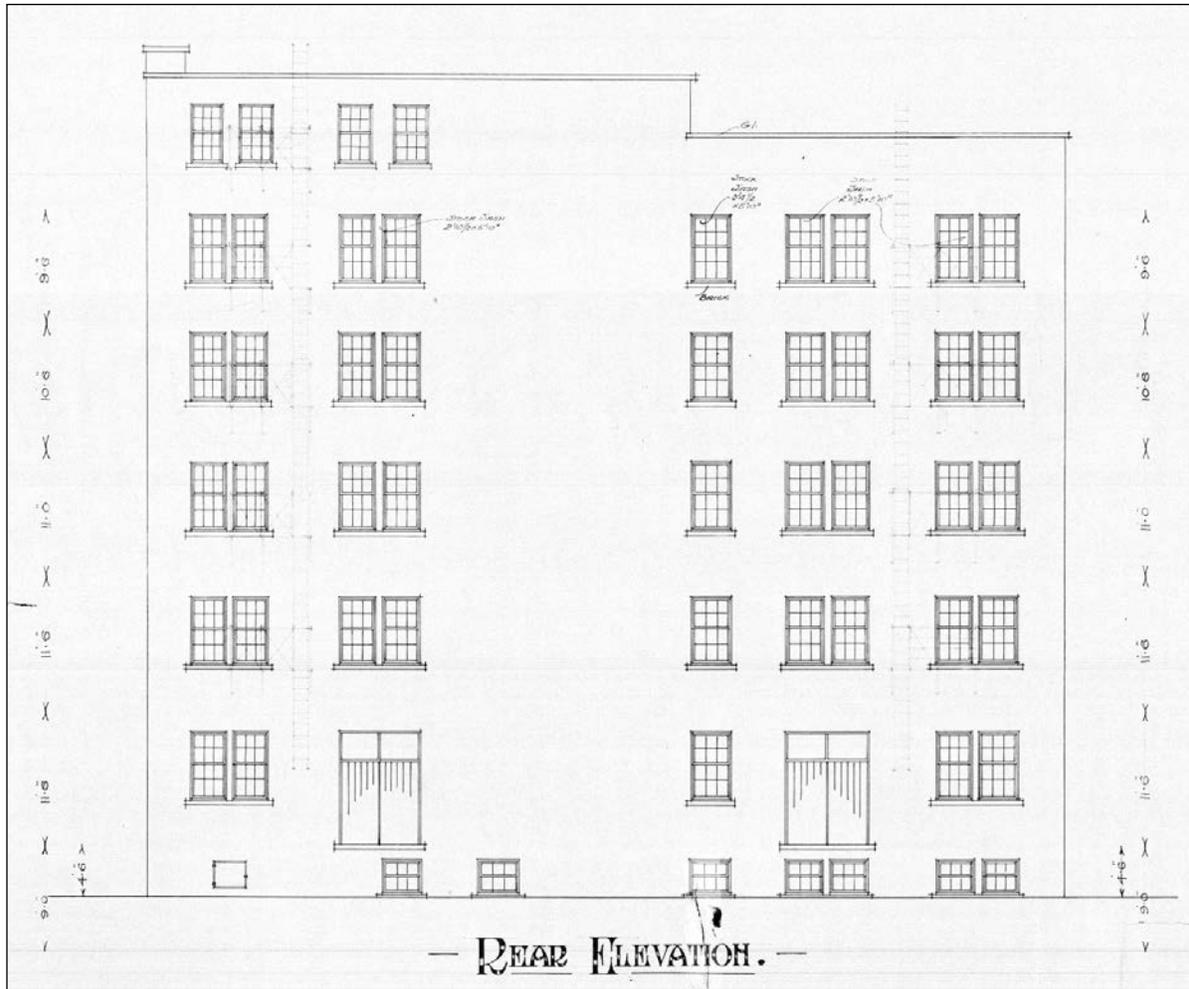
Architect’s plans, #3482/1912, “Rear Elevation.” (Courtesy of the City of Winnipeg Archives.)
